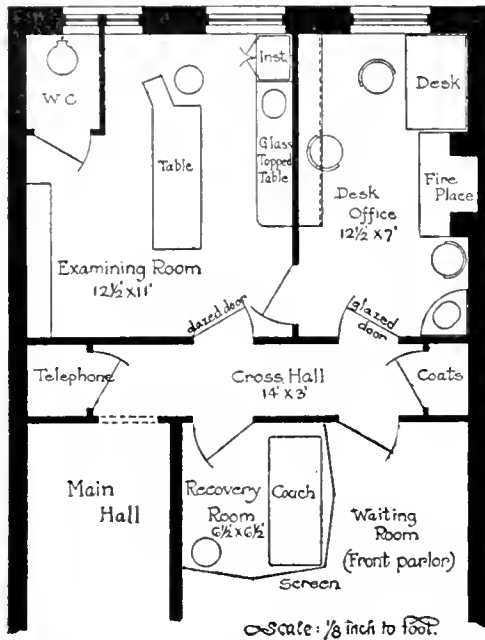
Ordinary 20-ft. house without extension altered for offices. Observe the rotation. The door between cross hall and waiting room is opened, and a patient taken into the desk office. When she is sent on to undress in the examining room a second patient may be taken into the desk office. The doctor can get out into his house, or one of the family approach him without going through waiting patients and without disturbing either a patient at the desk, on the table or on the recovery couch—one or all. The toilet is not accessible from the waiting room. The glazed door lights the dark cross hall, but shows figures dimly through, which is undesirable. The plumbing is scattering. There is a sink in the "glass-topped table," and shelves above it. A stool stands at the foot of the examining table, the other circles representing chairs. One of these is shown beneath the overhead shelves in the desk office. In a desk office as narrow as this the fireplace would better have been torn out.
